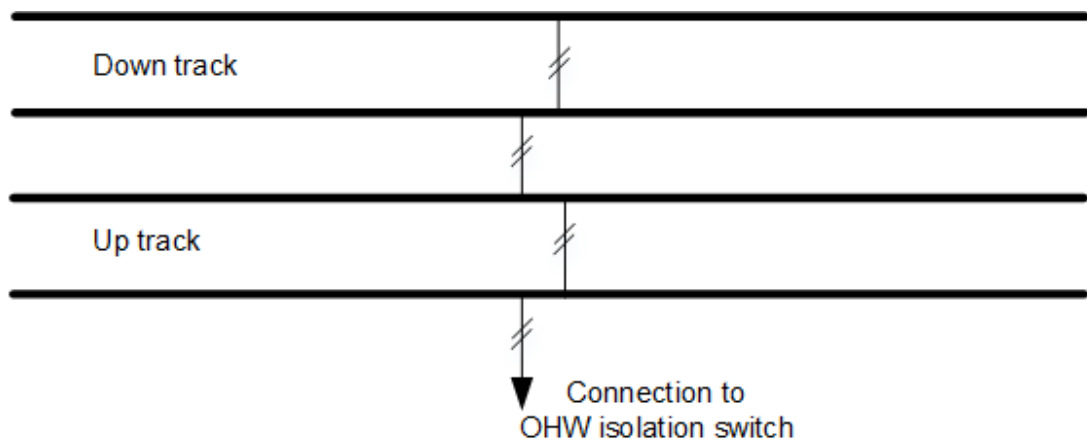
Arrangement for traction bonding at OHW to rail isolating switches
